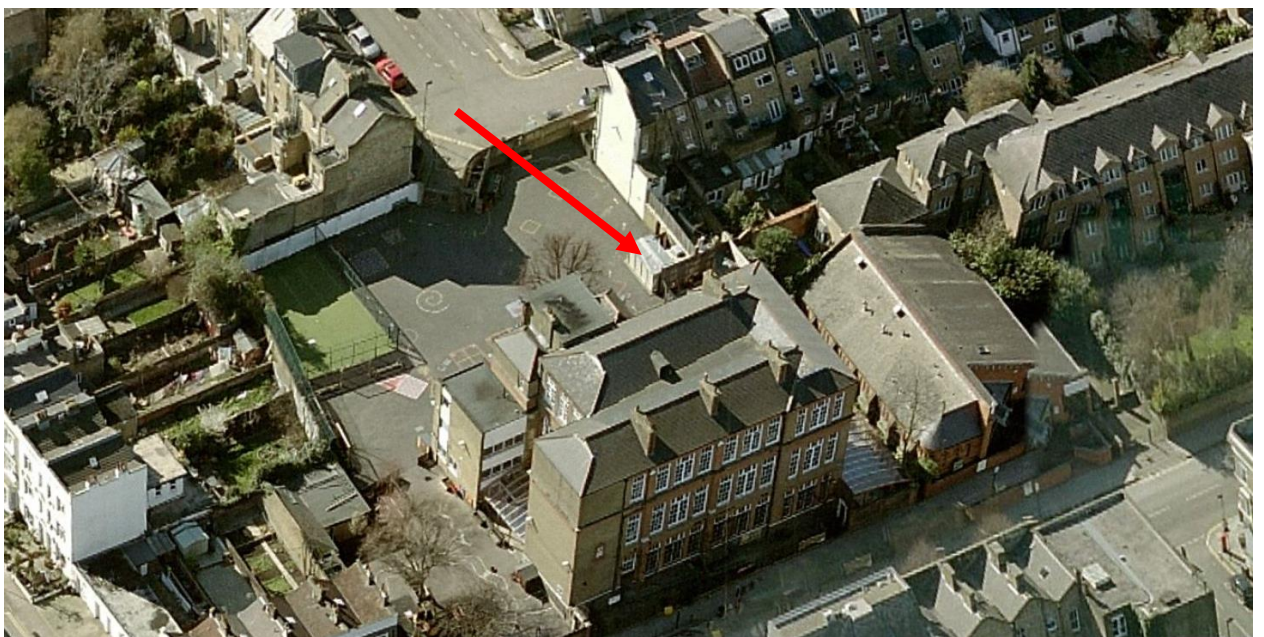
Aerial view of the site arrow pointing at location of classroom pod.
